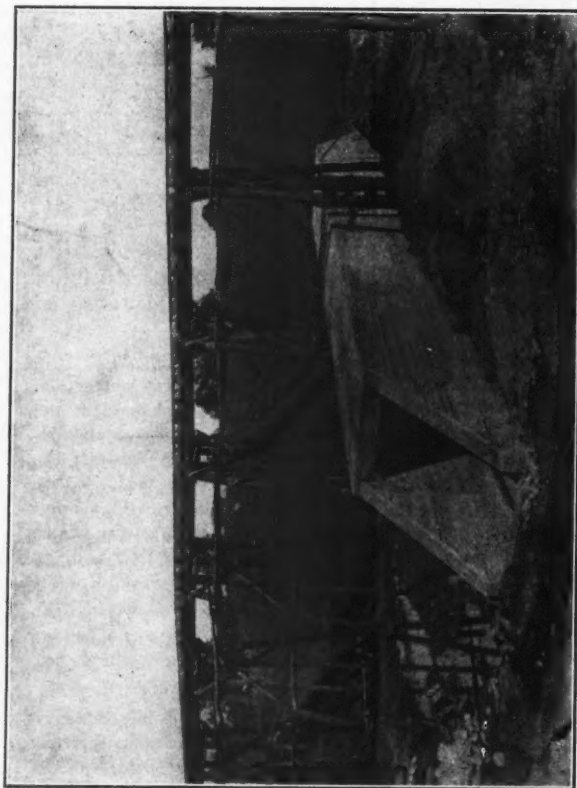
Concrete Box Culvert, C., B. & Q. R. R.
